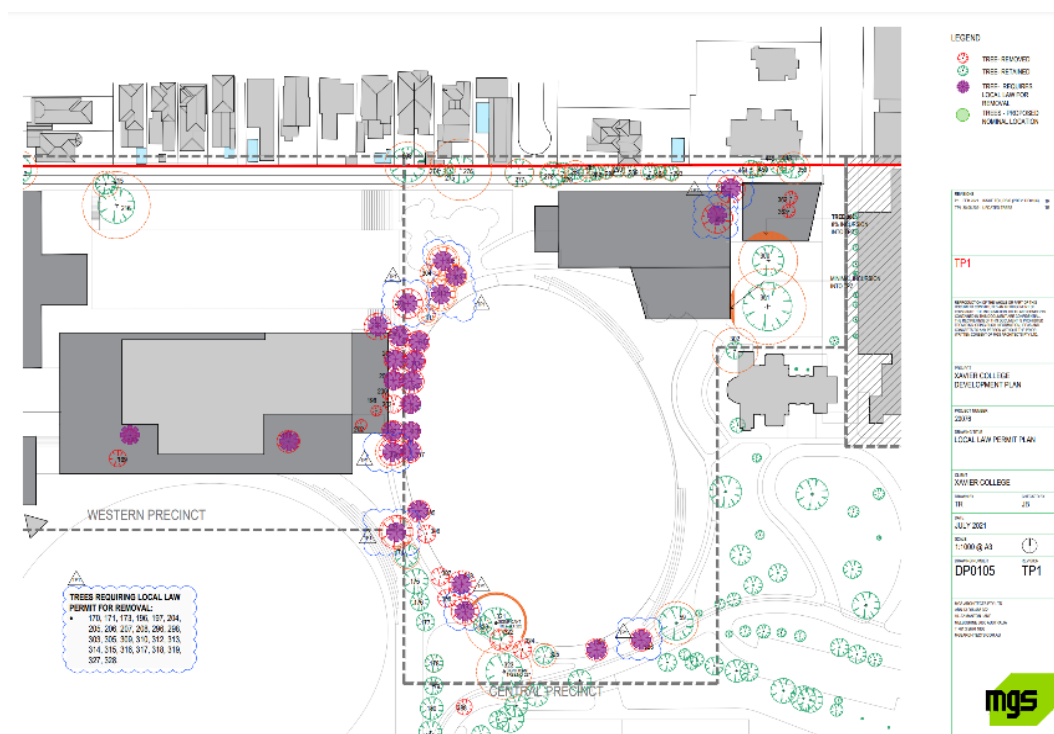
Excerpt from Local Law Permit Plan DP0105 TP1. (MGS Architects, July 2021).
